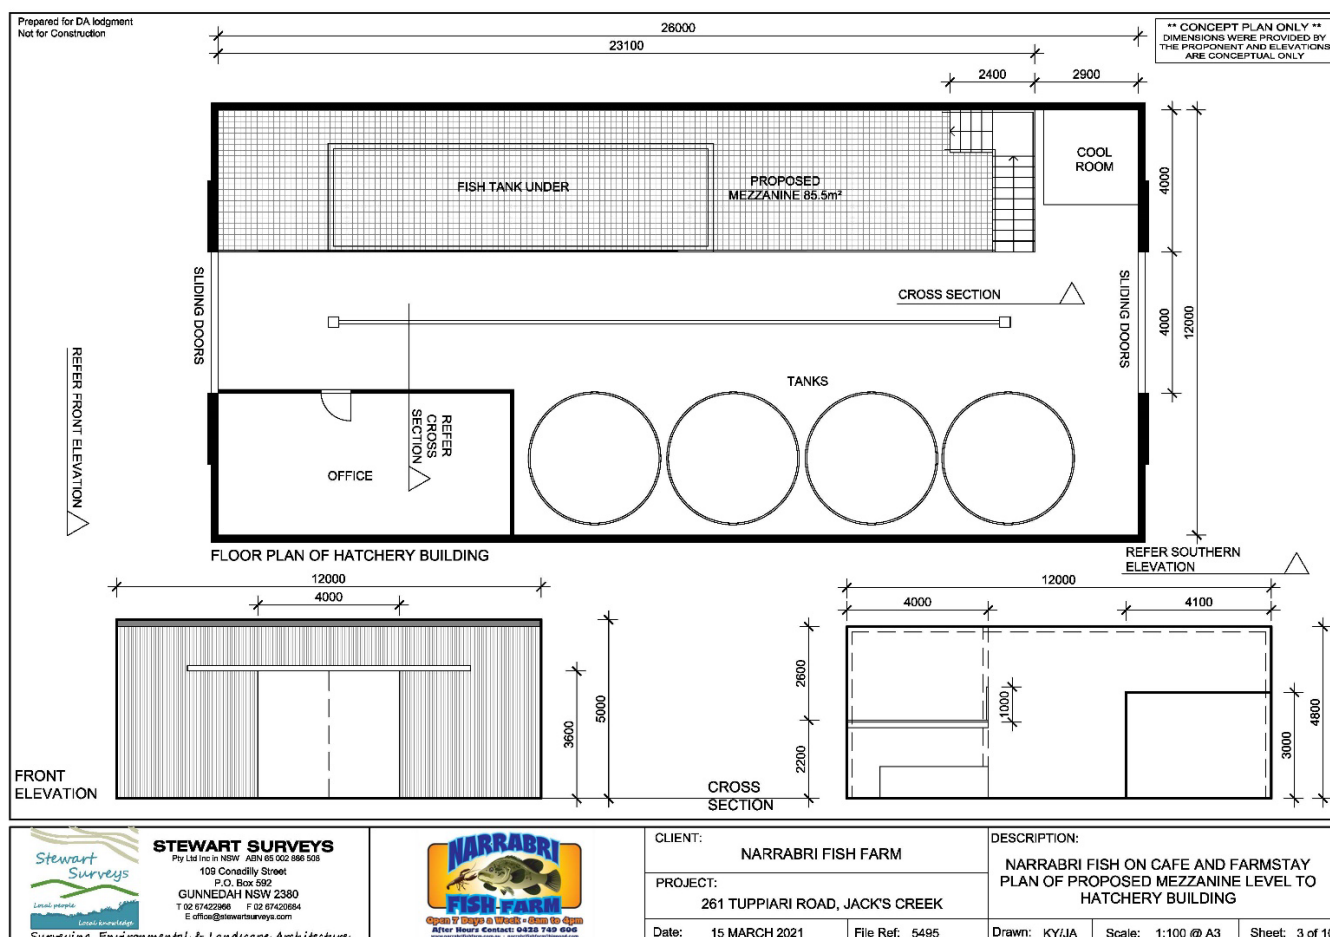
Floor Plan & Cross Section of Proposed Mezzanine Level to Hatchery Building
